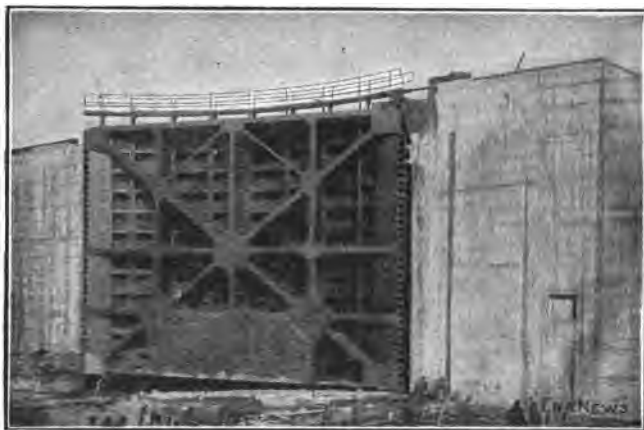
Steel miter gates for lower end of lock, showing buoyancy chamber.
